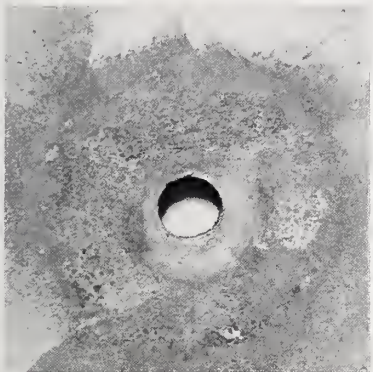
Corrosion of galvanized steel due to contact with a lead sealing washer.
